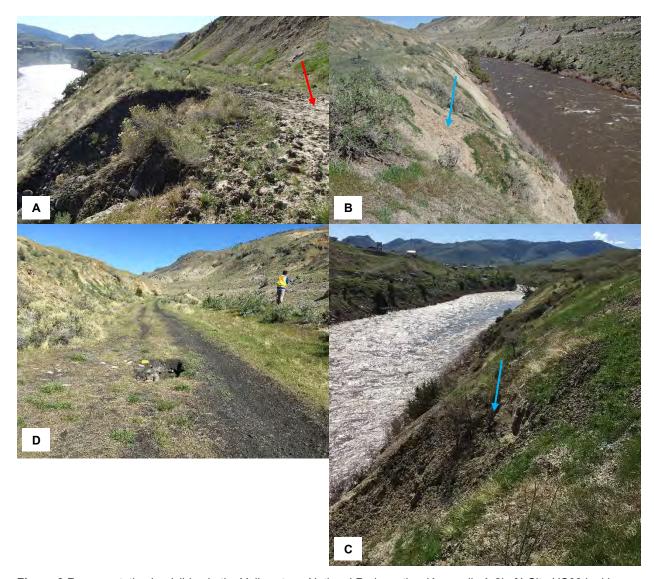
Representative rockfall slopes in the Yellowstone National Park section (Appendix A-2). A) Site US02, red arrow denotes a small alluvial fan of sediment overlying trail approximately 1 foot thick. B) Site US06, displaying boulders and cobbles differentially eroding out of an oversteepened cut slope of unconsolidated glacial outwash deposits. Plentiful rockfall is observed on the trail.
